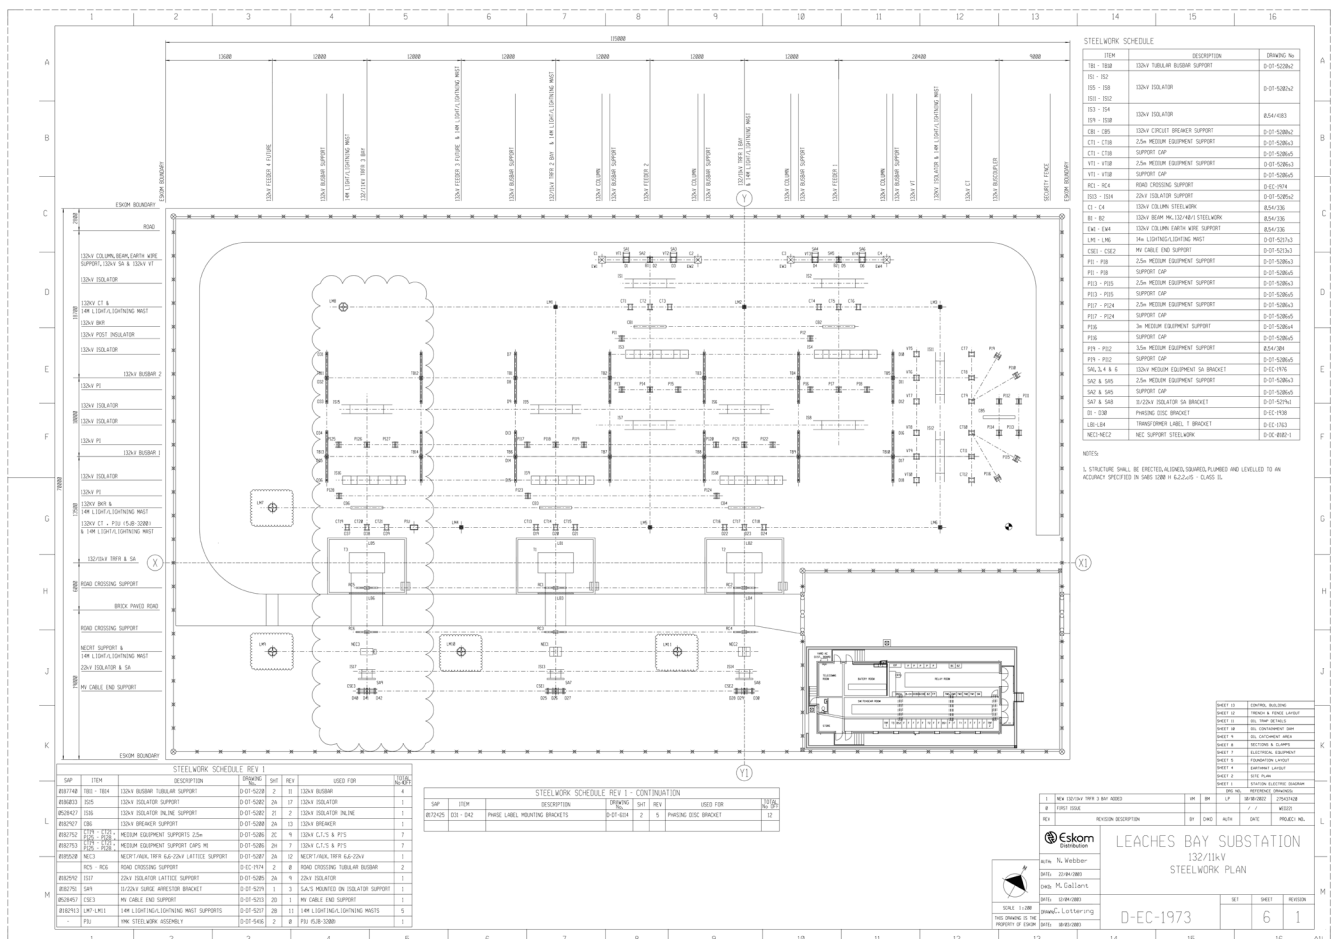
Steelwork Layout for the new 132/11kV Transformer Feeder bay No.3
